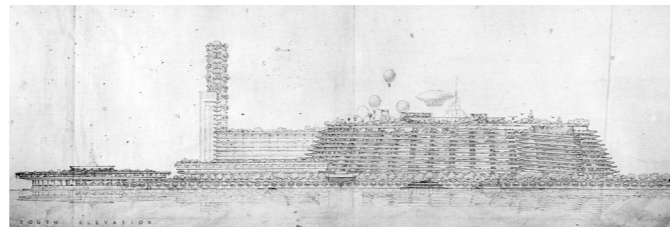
Point Park Project. First Scheme. South Elevation, 1947.
